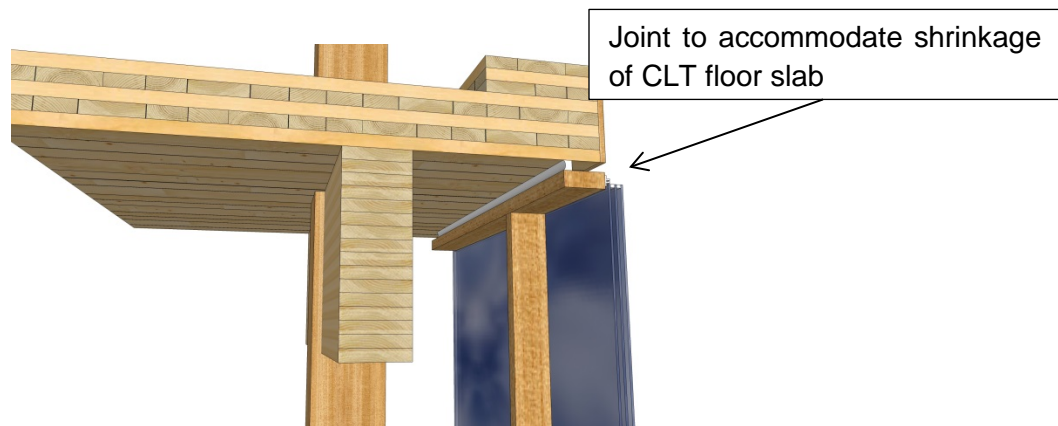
Joint provided between floor and wall to accommodate shrinkage of CLT floor slab (Courtesy of RDH Building Science Inc.)
